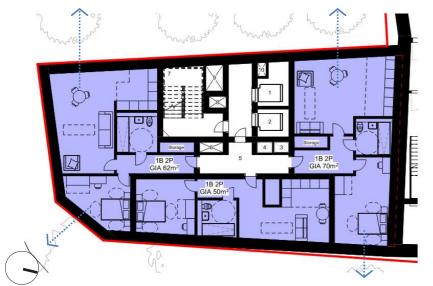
Pre-Application Meeting 6 - Type A Typical floor 3x1B unit proposal
